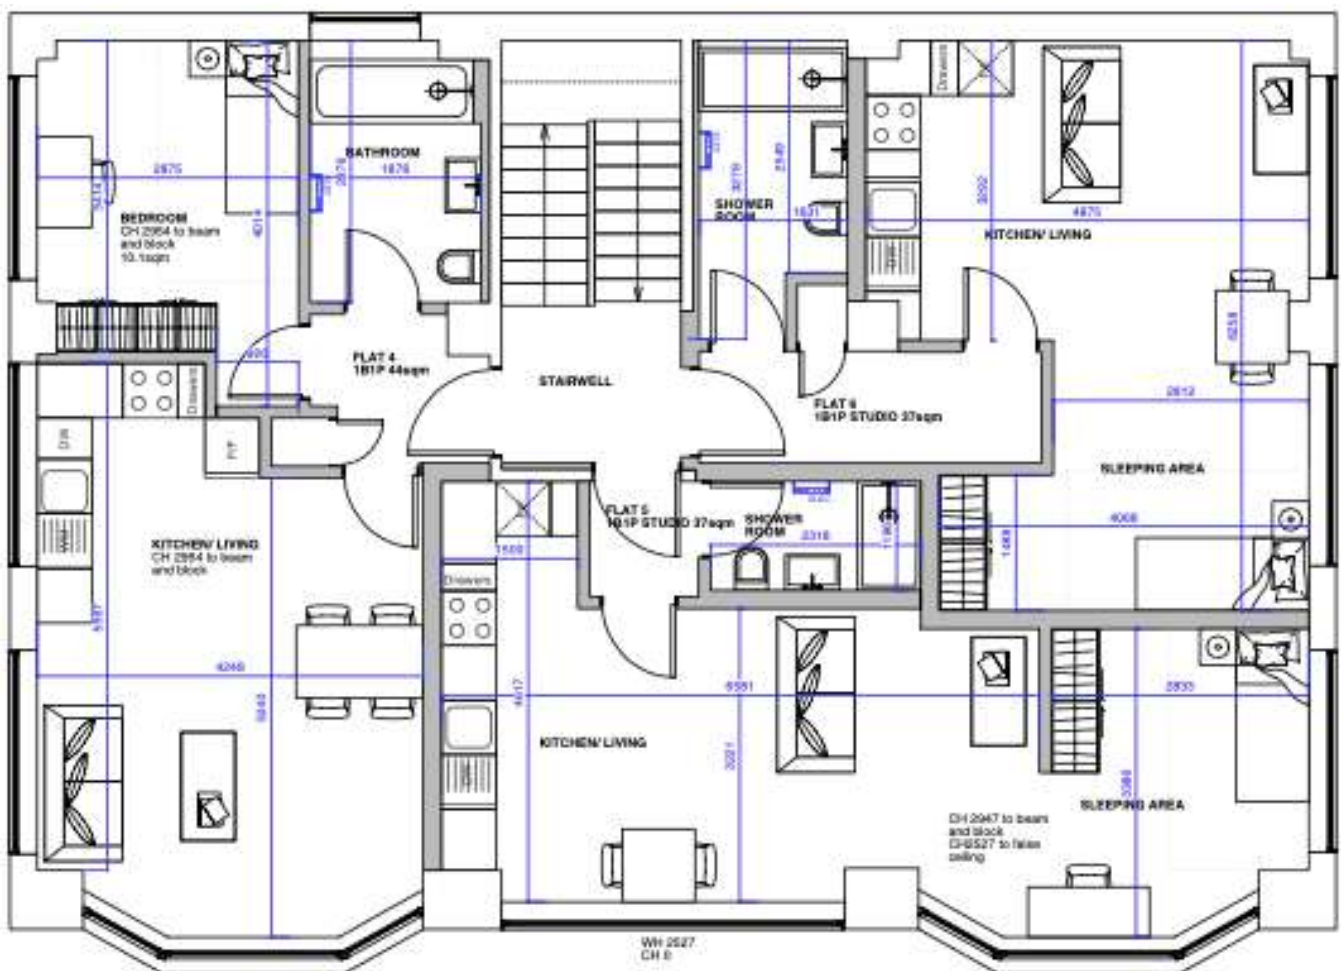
Architectural Drawings of Proposed First Floor
